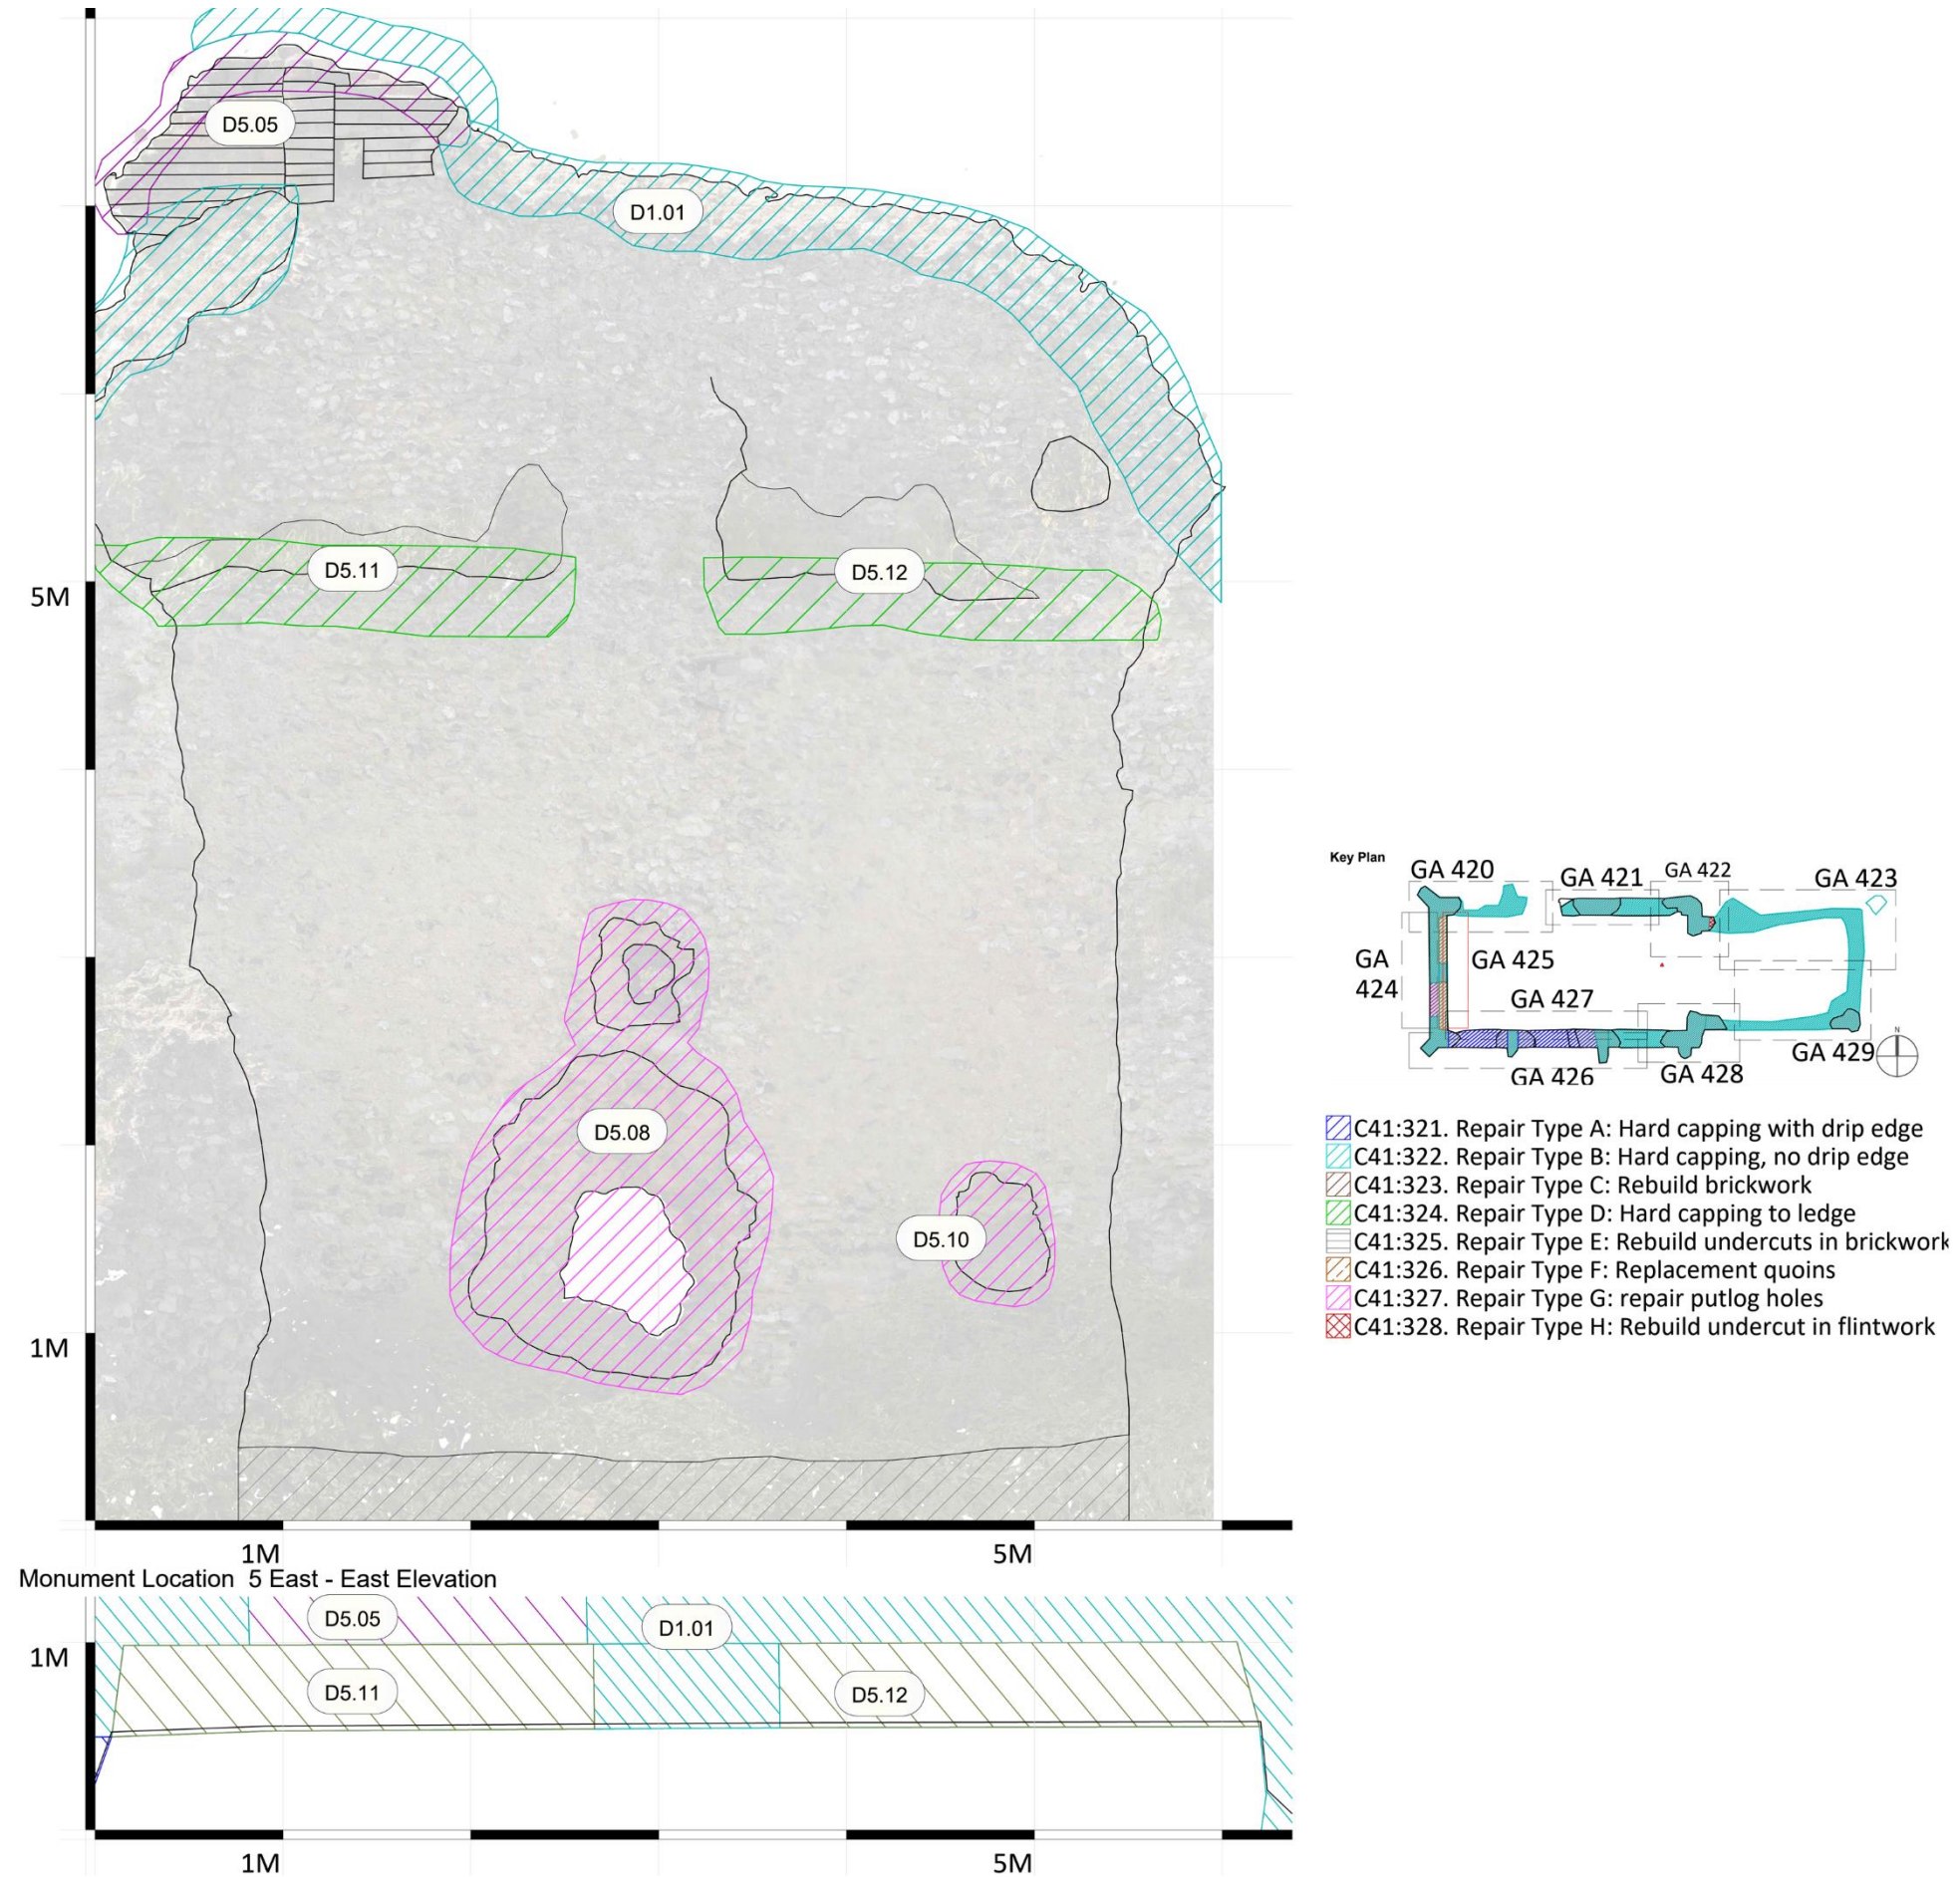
Works undertaken to the east elevation of the west wall (scale 1:40)
